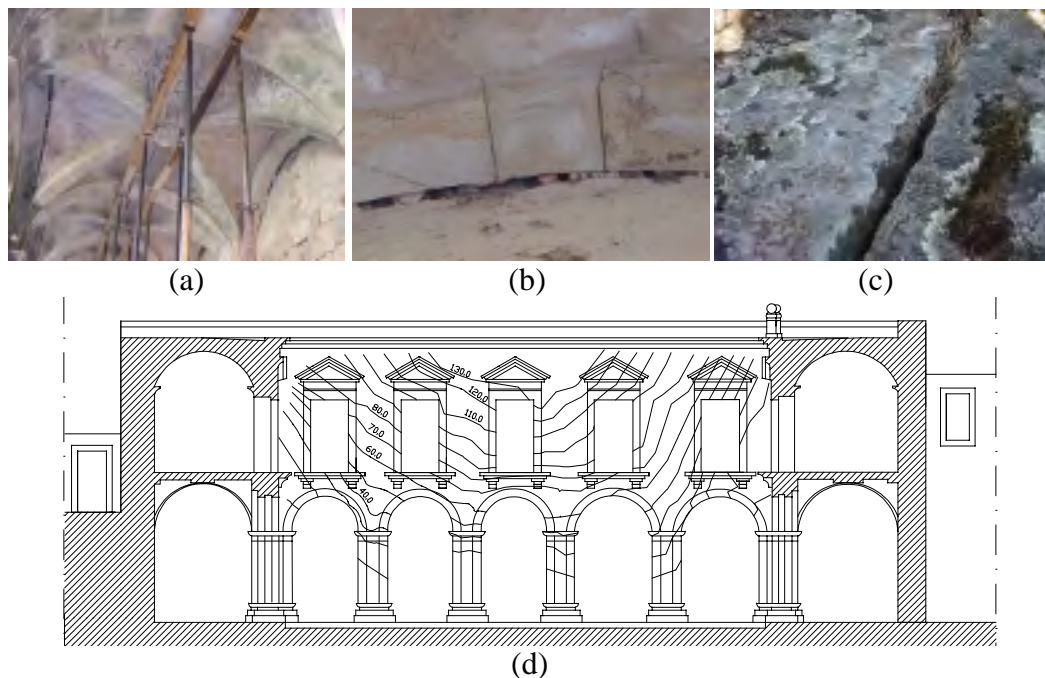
Aspects of the wall movements: (a) separation between wall and vault (intrados of 1st level), (b) detail, (c) separation between wall and vault (extrados of 2nd level) and (d) horizontal movements in the direction of the court
